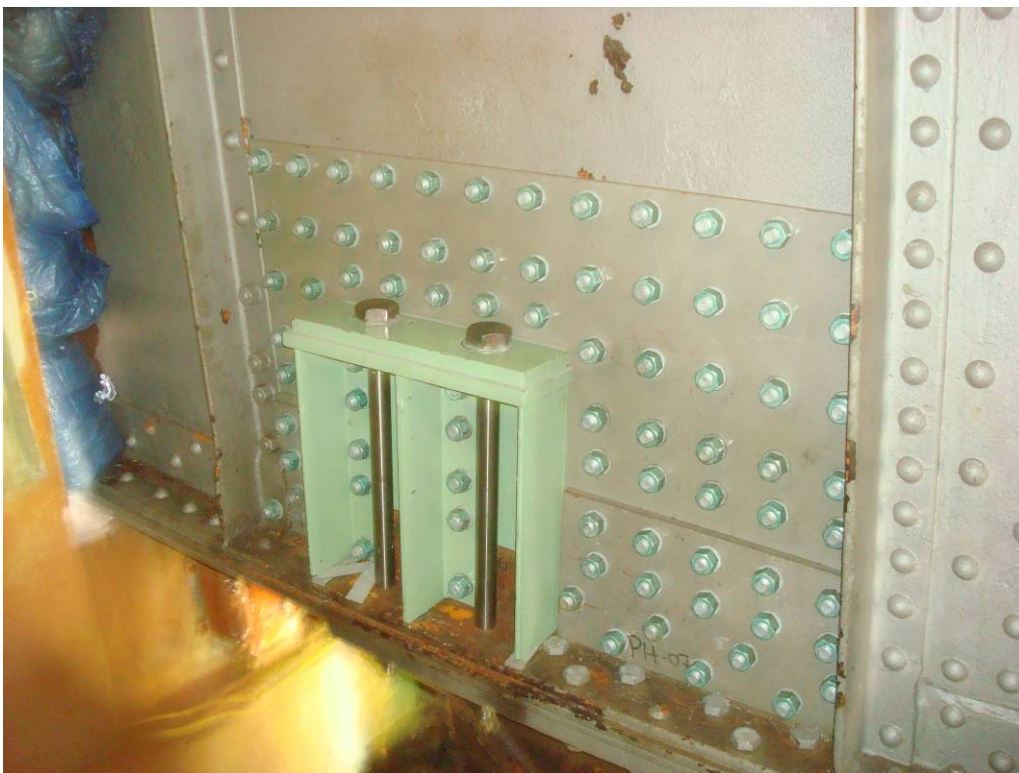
The Southwest girder (West face of girder) rack stiffener repair. Shims need to be completed.
